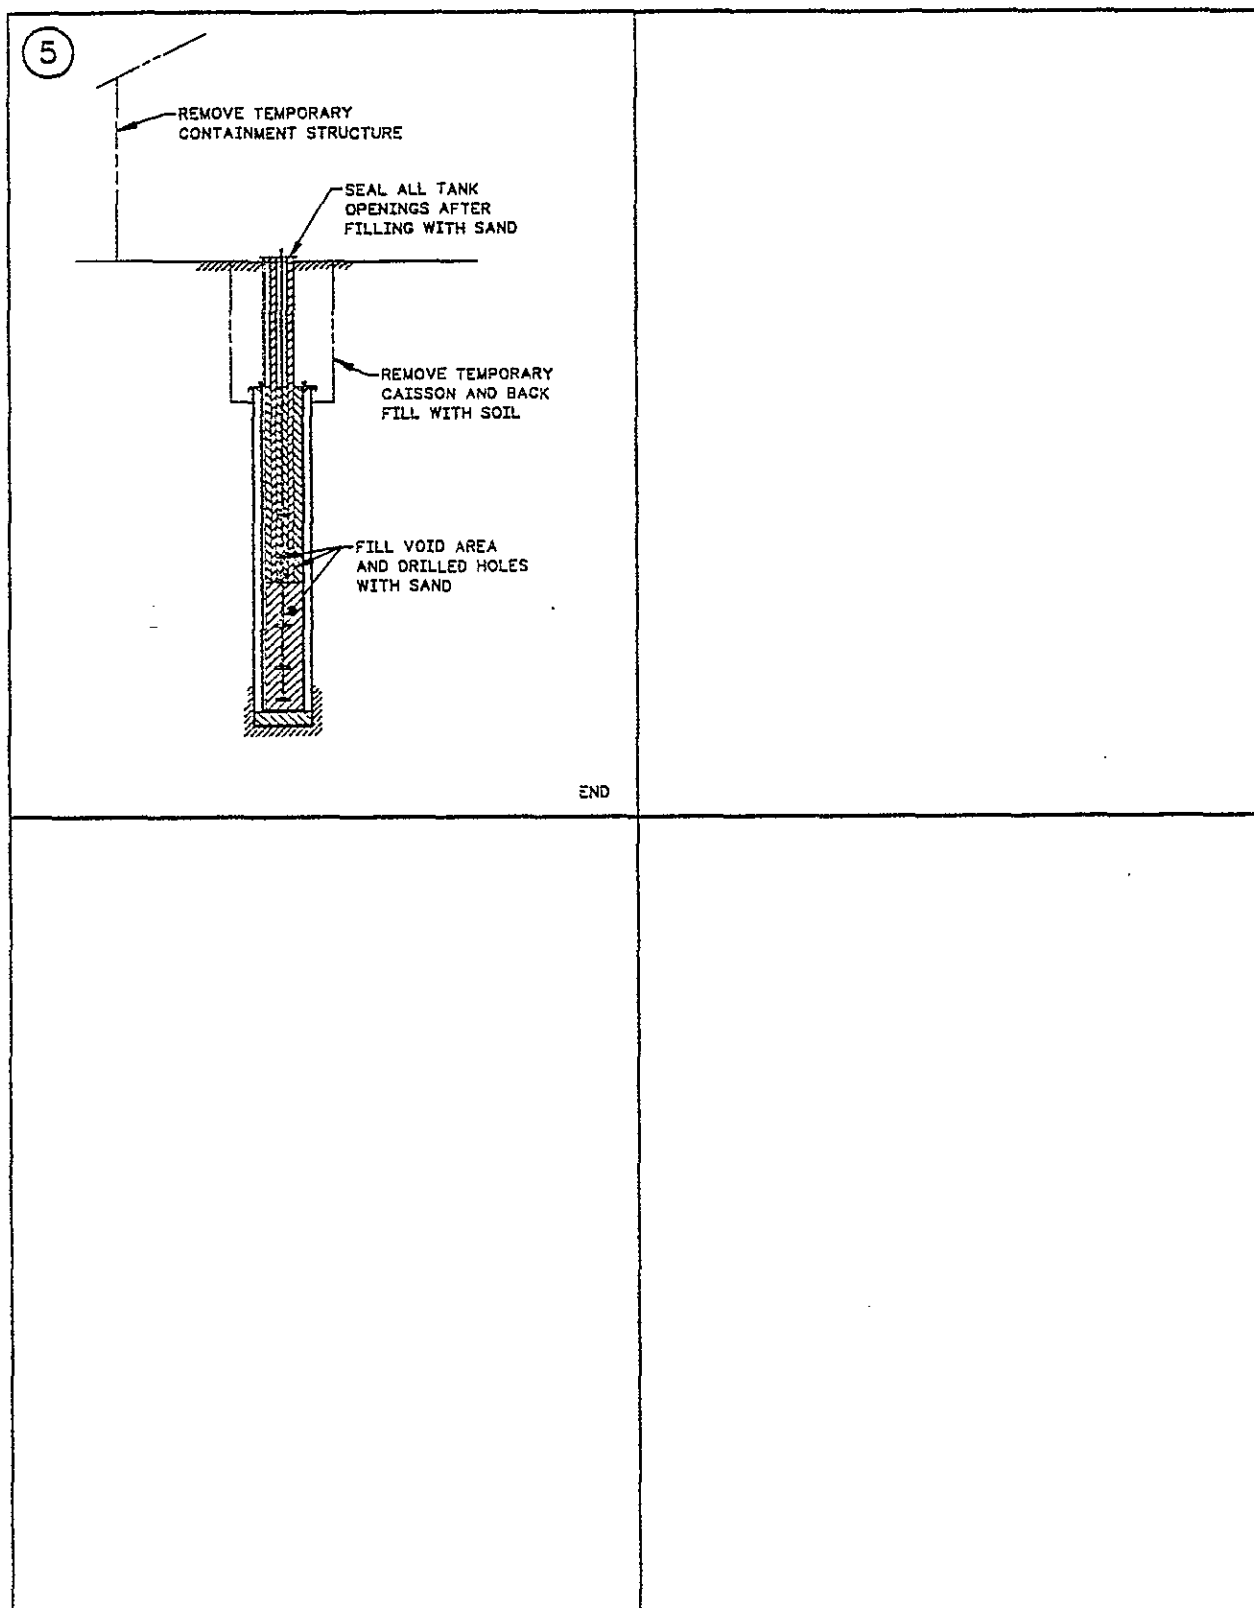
Sheet 2. Alternative B - Leave Grout in Place, Sluice Sludge.
